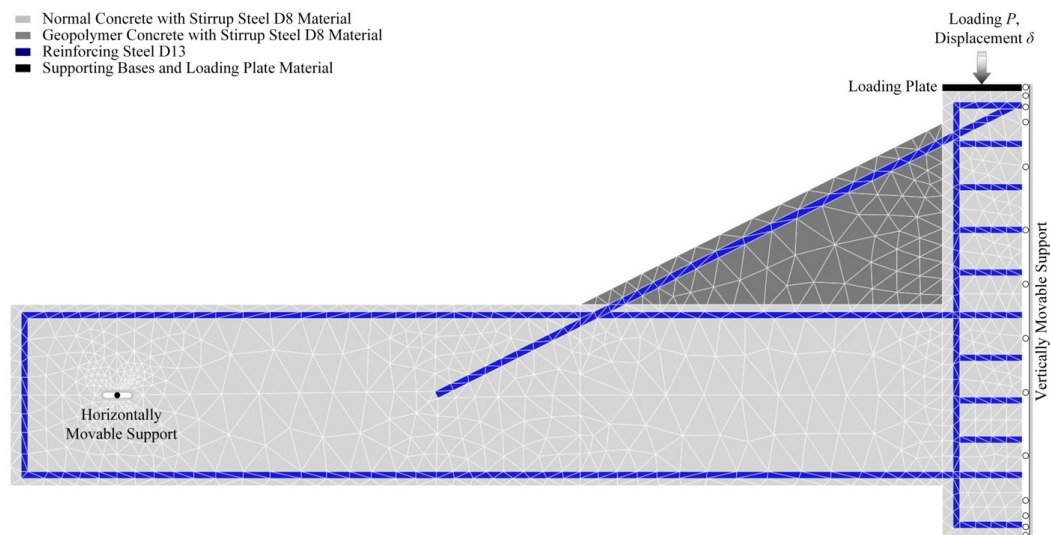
Symmetric haunch strengthened half-span beam-to-column RBSM
